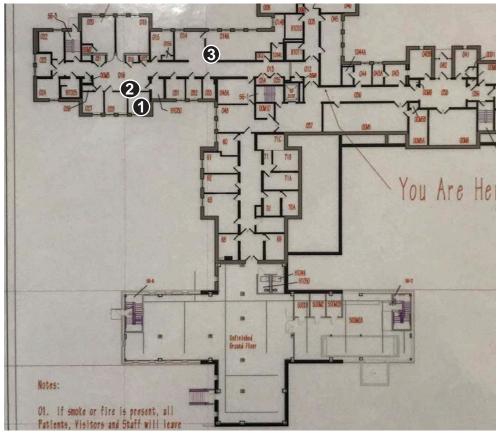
Floor Plan of McLean Hospital, Clinical Evaluation Center Plan
